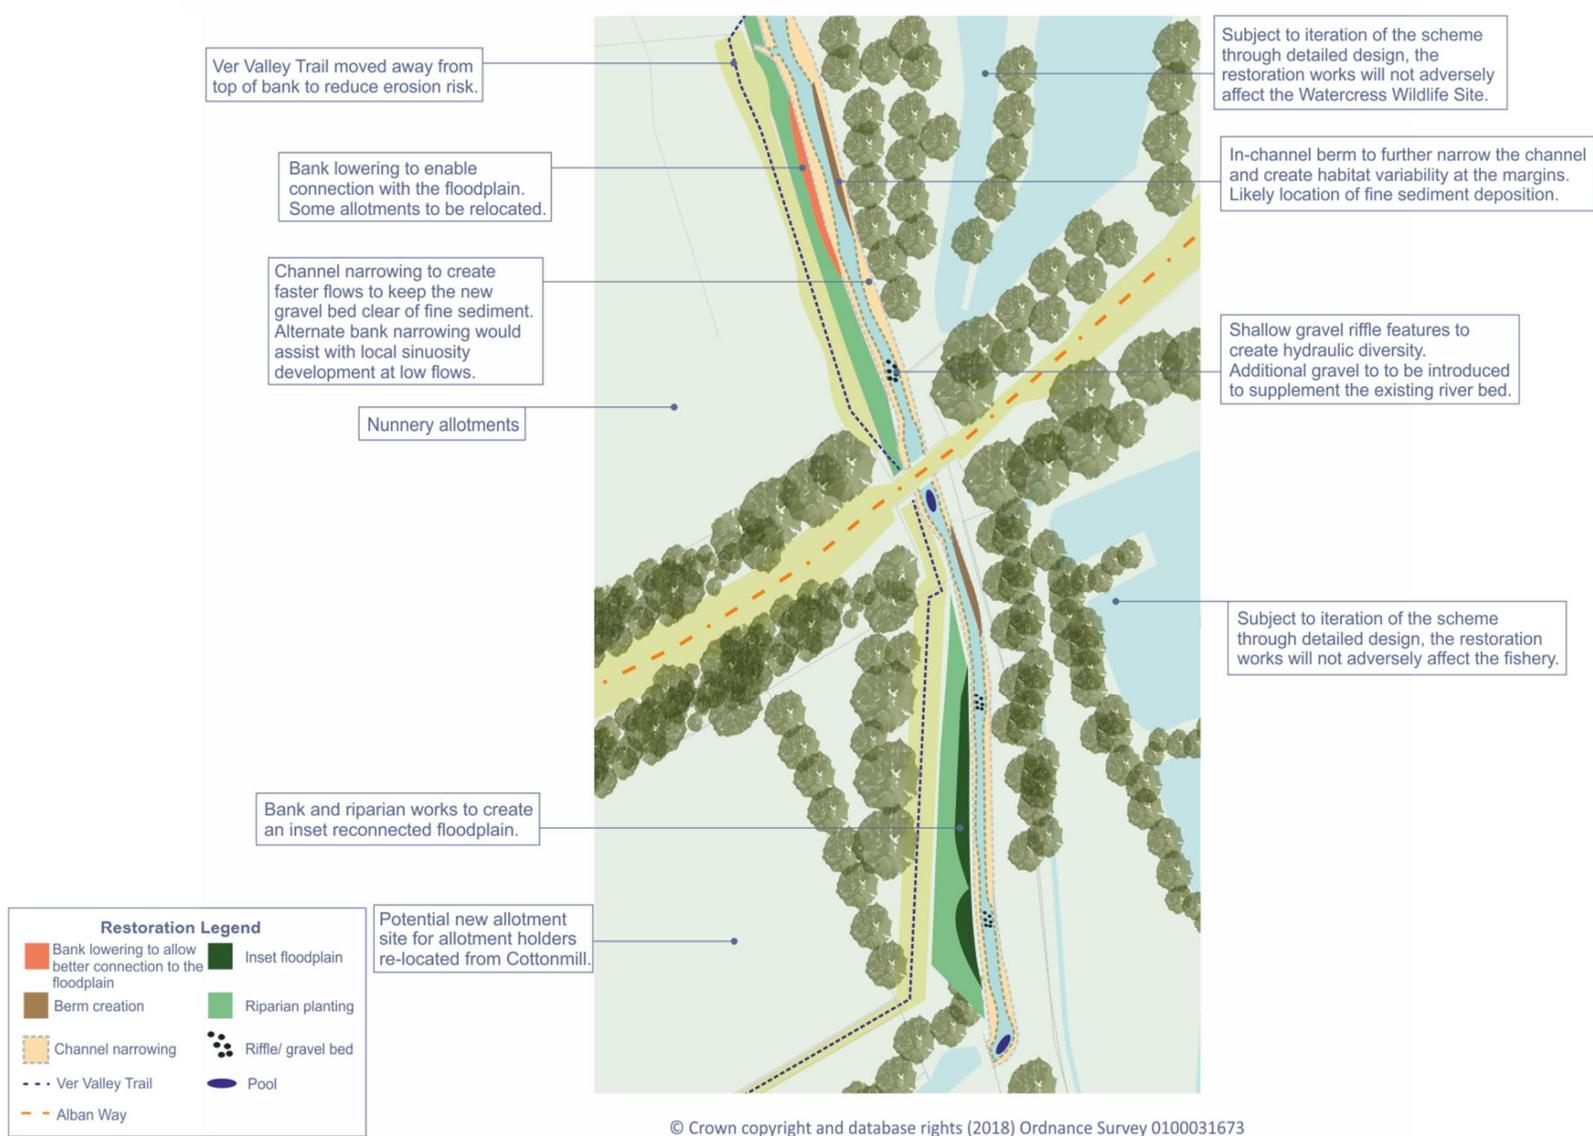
Reach 6 Final Outline Proposal Plan (post engagement)
